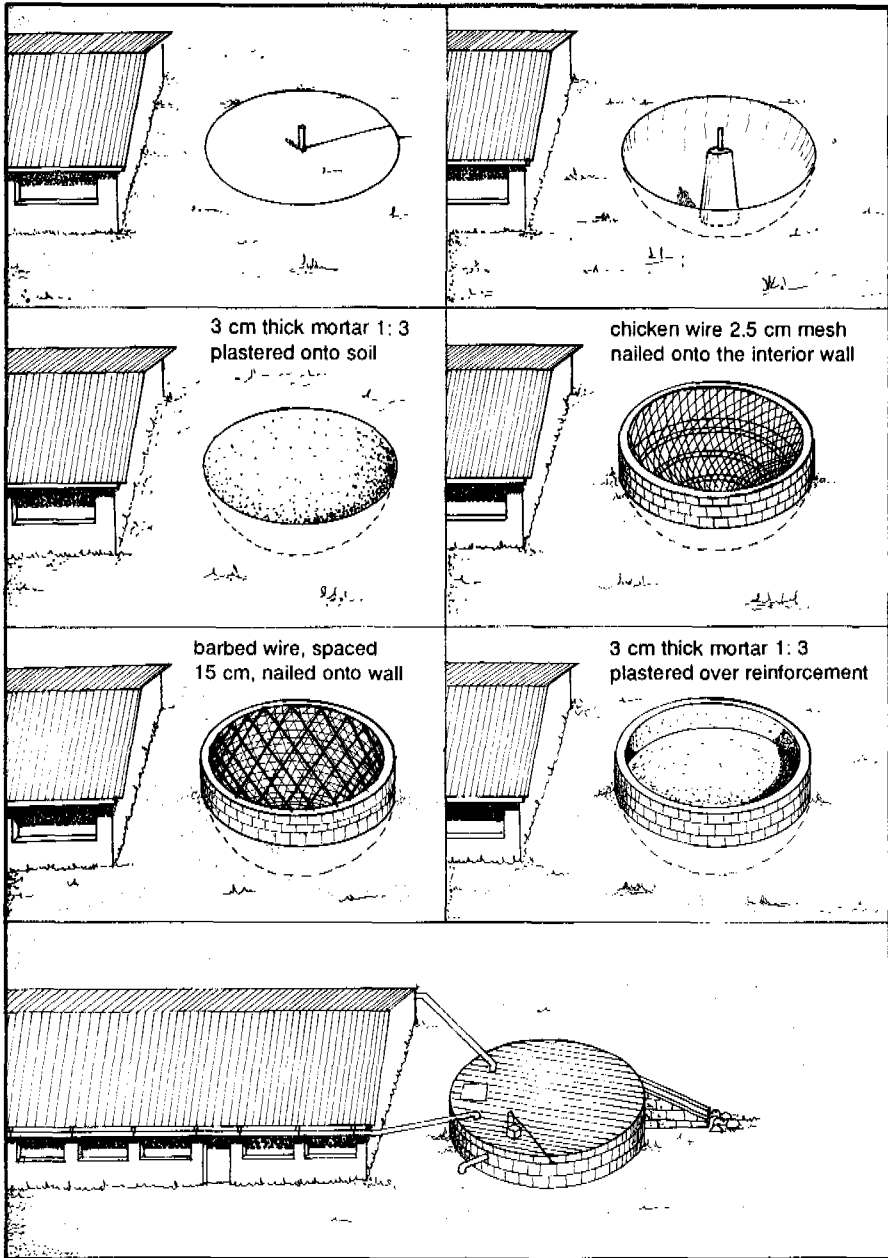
Stages in the construction of a 78 m<sup>3</sup> ferrocement ground tank (Lee and Nissen-Petersen, 1989)
